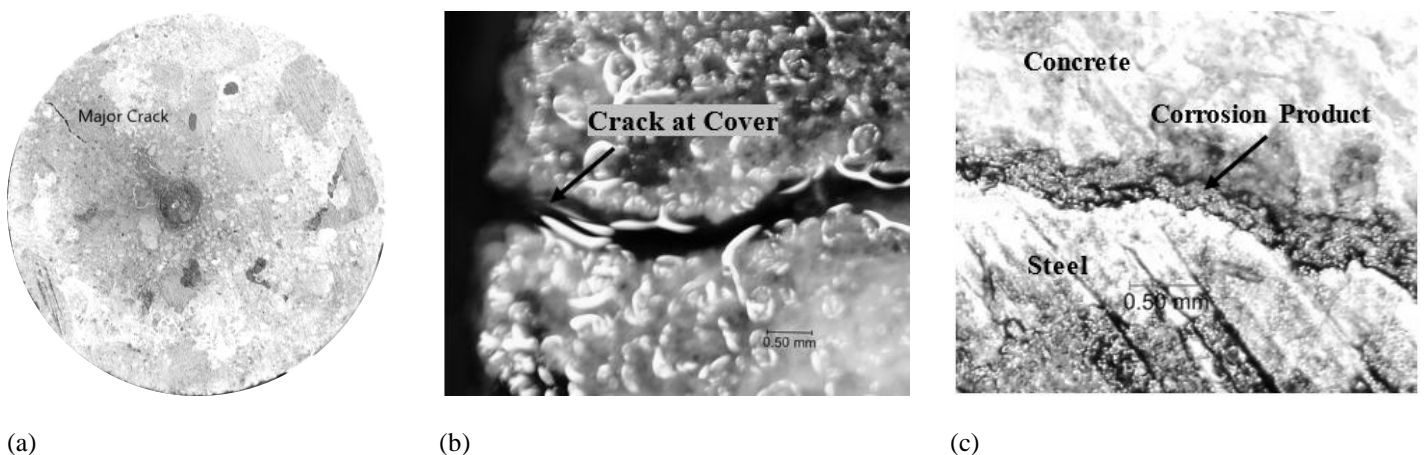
Crack pattern of the specimen (a) cylindrical plate specimen (b) crack mouth opening at cover (c) corrosion product build up at steel concrete interface.
